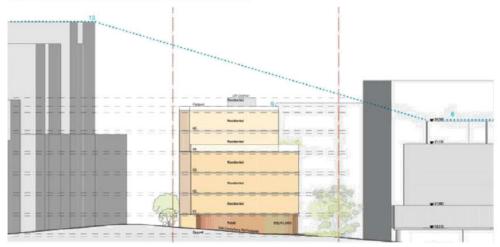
Indicative building elevation viewed from Old Canterbury Road (Source: The Yard 120C)
